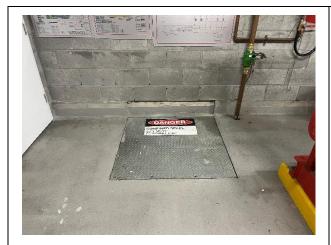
Lower Ground, Sprinkler Tank and Pump Room, Unknown Pit
